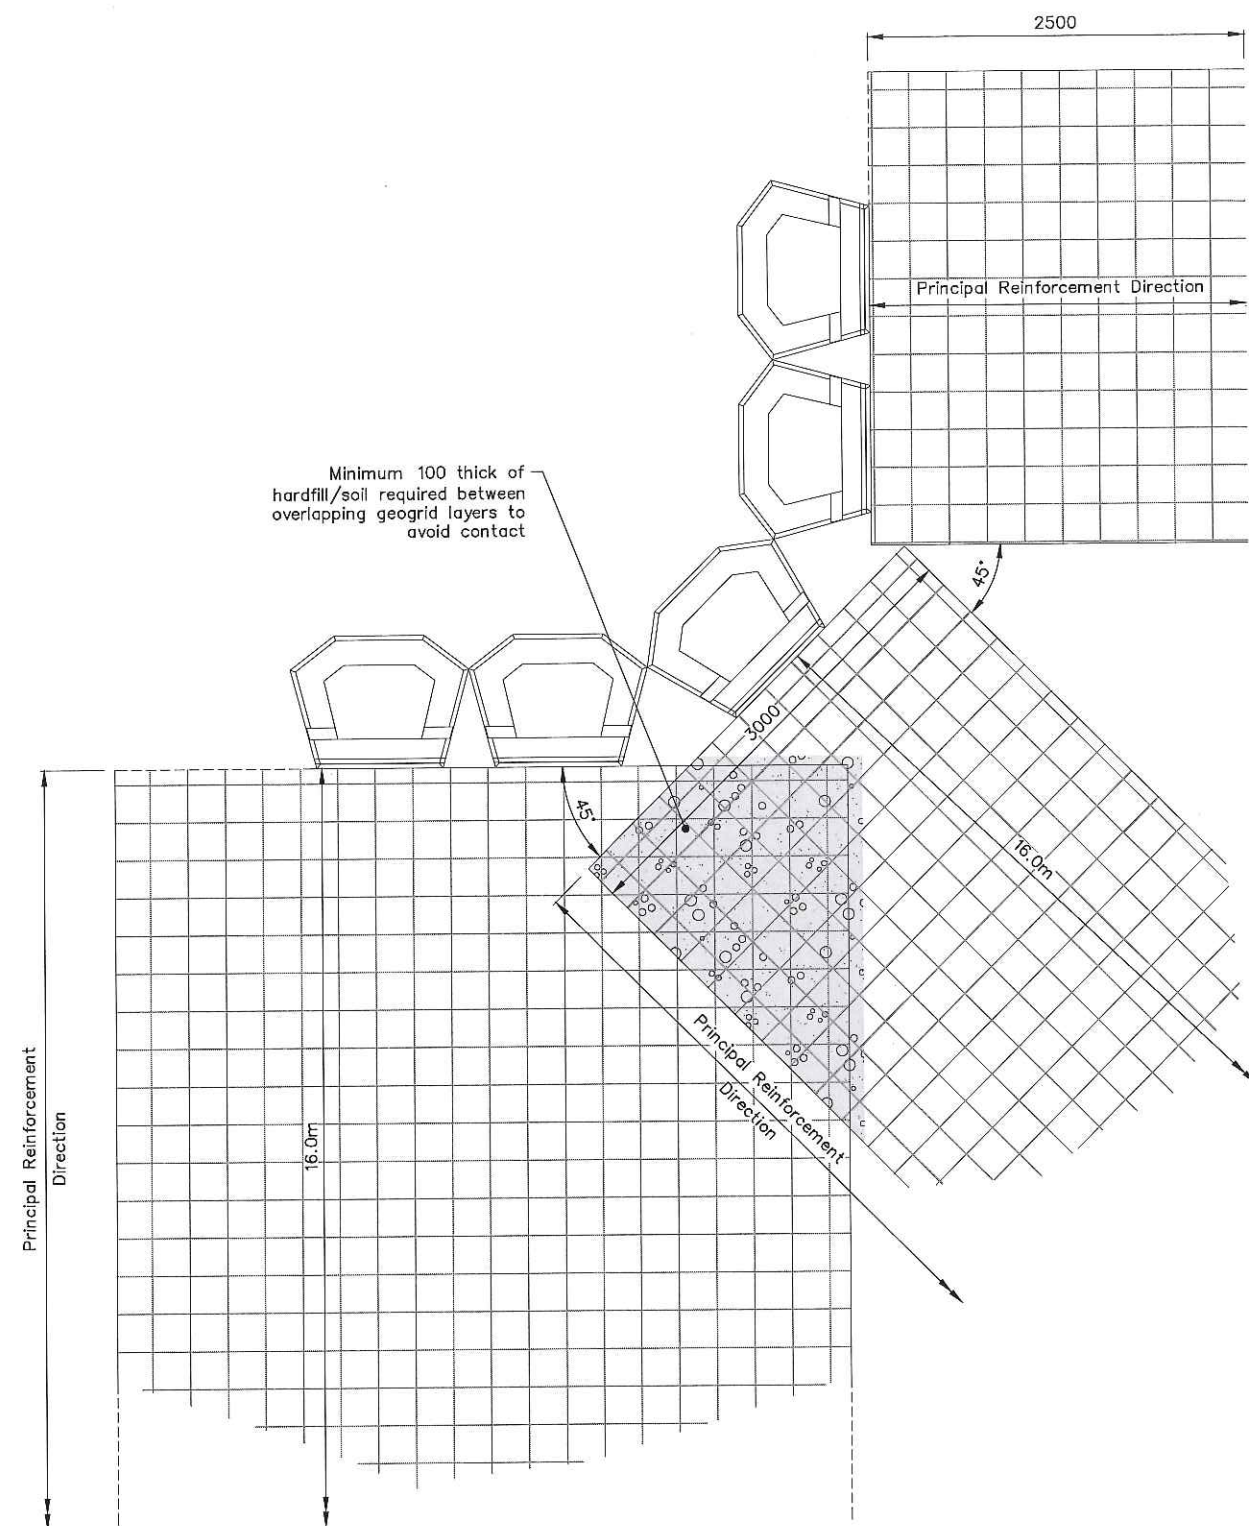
DETAIL B RETAINING WALL 03 – MASSBLOC WALL DETAIL
